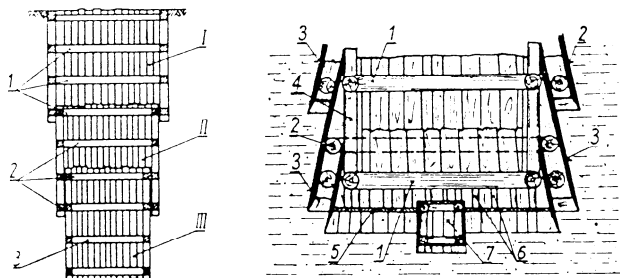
Sketch of wooden pile wall for rectangular shaft. a) vertical method, with diminishing lateral section, I,II,III,IV subsequent segments, b) oblique method, with steady lateral section
